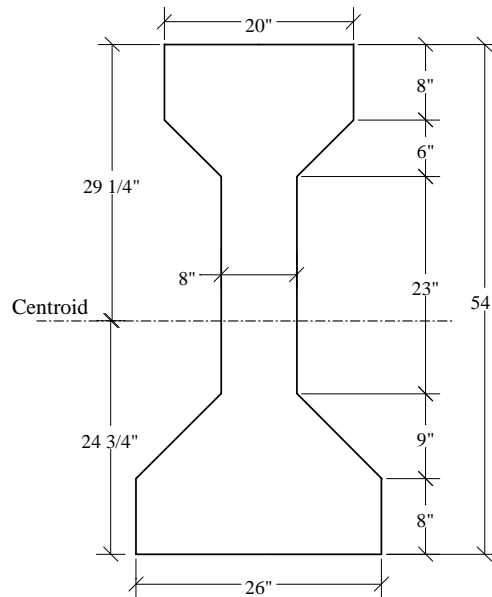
Cross Section of a Typical Type IV, Precast, Prestressed Concrete Girder
